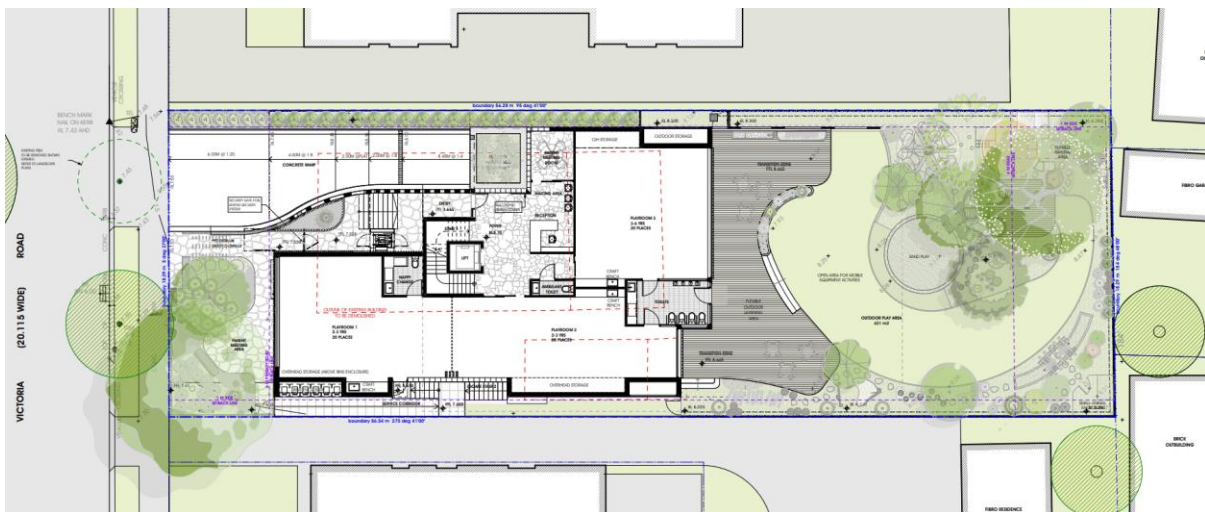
Extract of proposed ground floor level (Source: Design Building Group, 2023).
